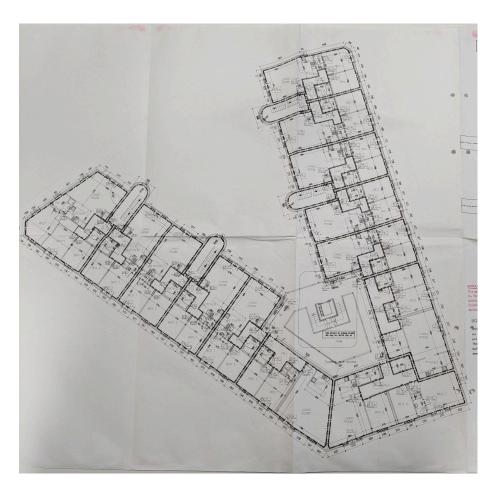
Typical floor plan of Aura Court, 1 Percy Street
